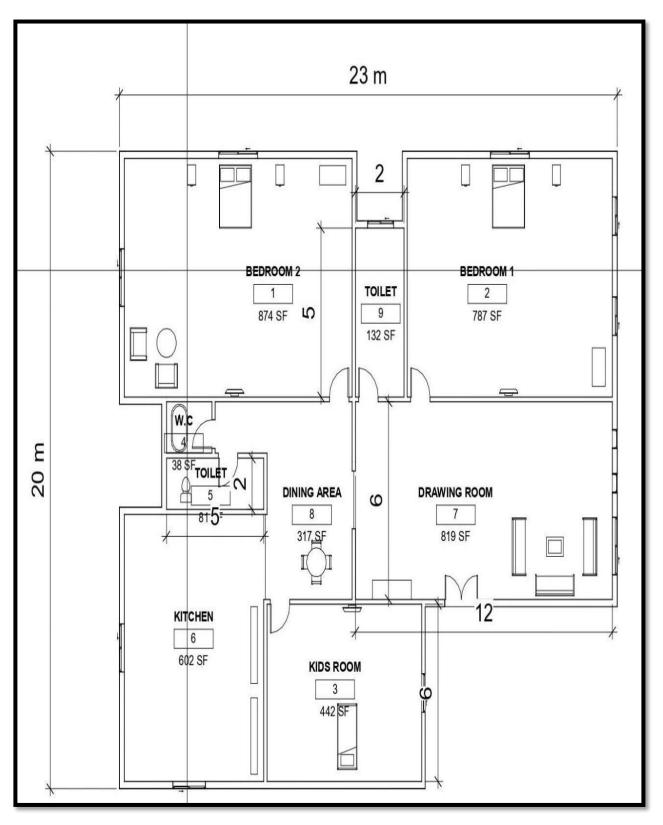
PLAN FOR GUEST HOUSE IN MODAJ VILLAGE
